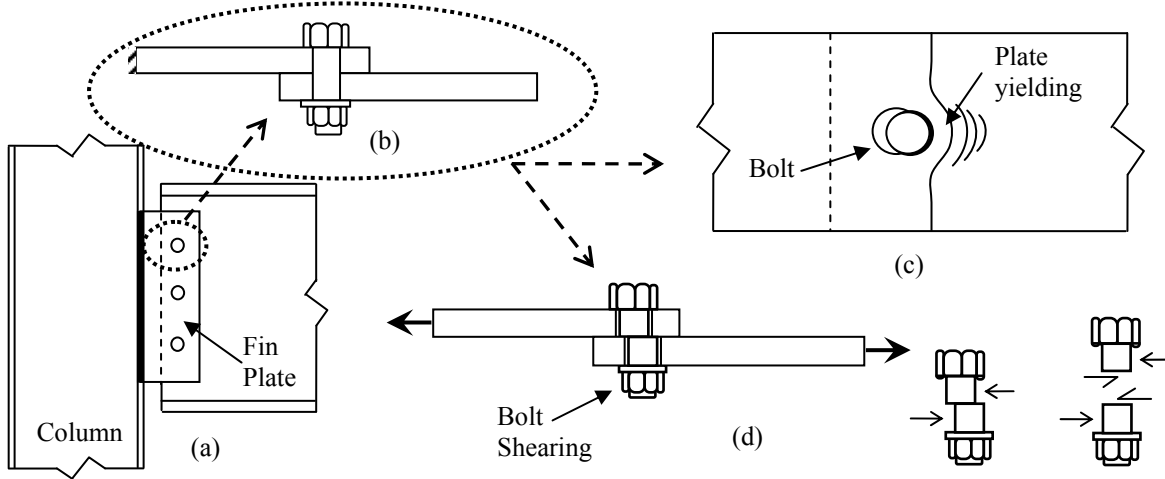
(a) Fin-plate connection; (b) lap joint; (c) plate bearing; (d) bolt in shear.
